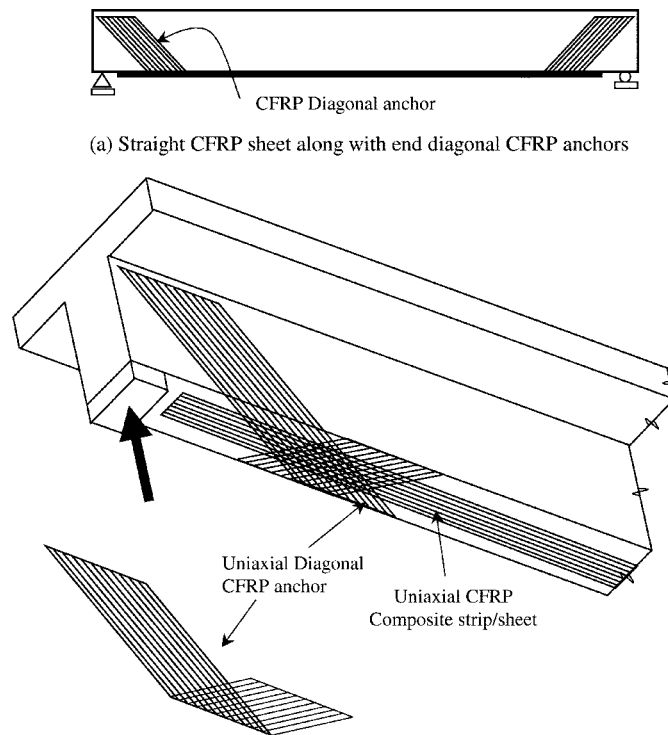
Flexural strengthening of reinforced concrete beam with straight CFRP system, and end diagonal CFRP anchors
